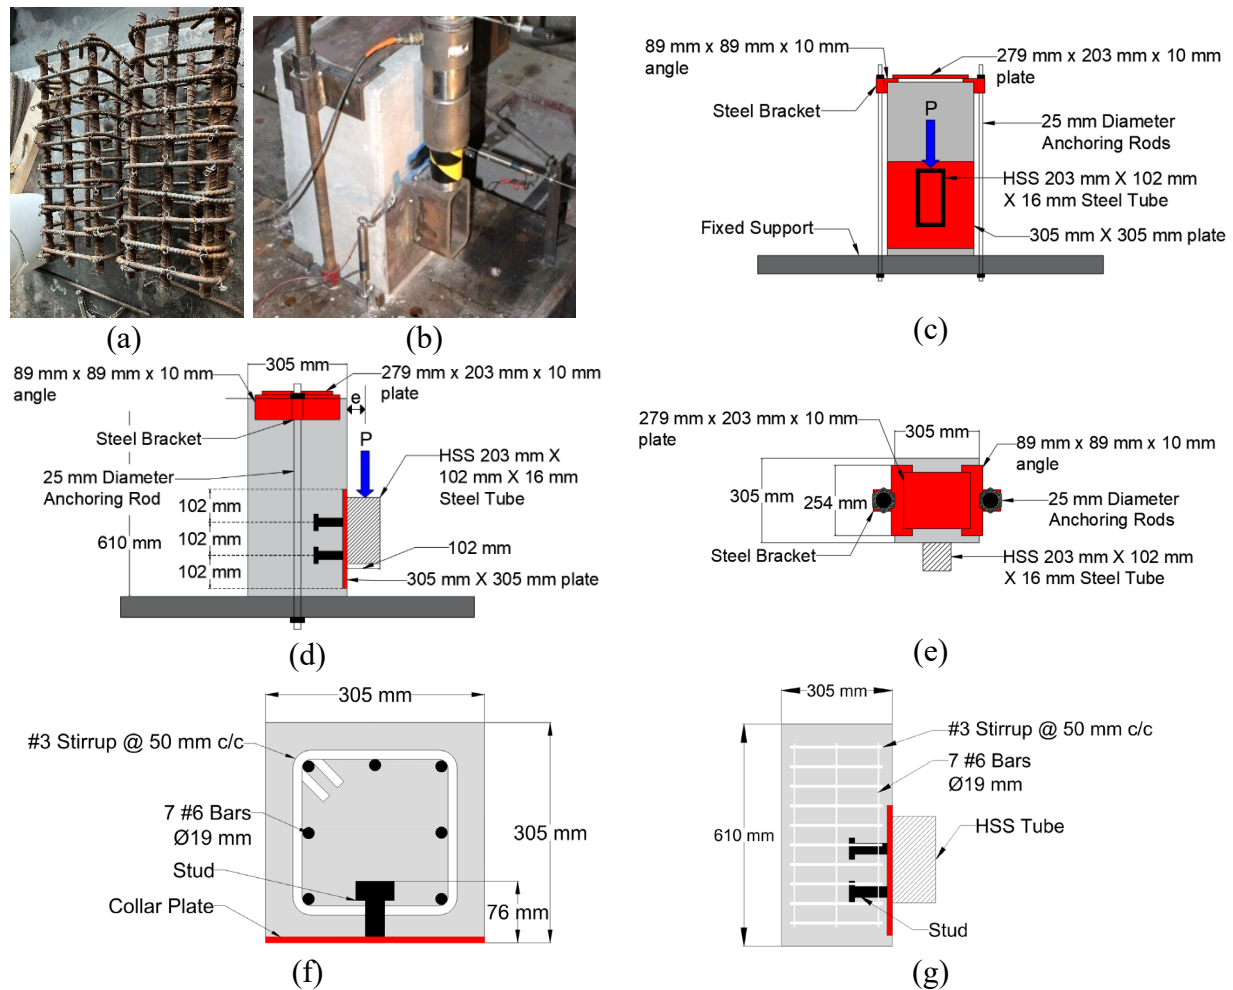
Specimen details: (a) column stub reinforcement cage; (b) column stub, steel collar plate, HSS tube, load cell, load and LVDTs; (c) elevation; (d) side view; (e) plan view; (f) column stub cross-section; and (g) elevation showing reinforcement.
